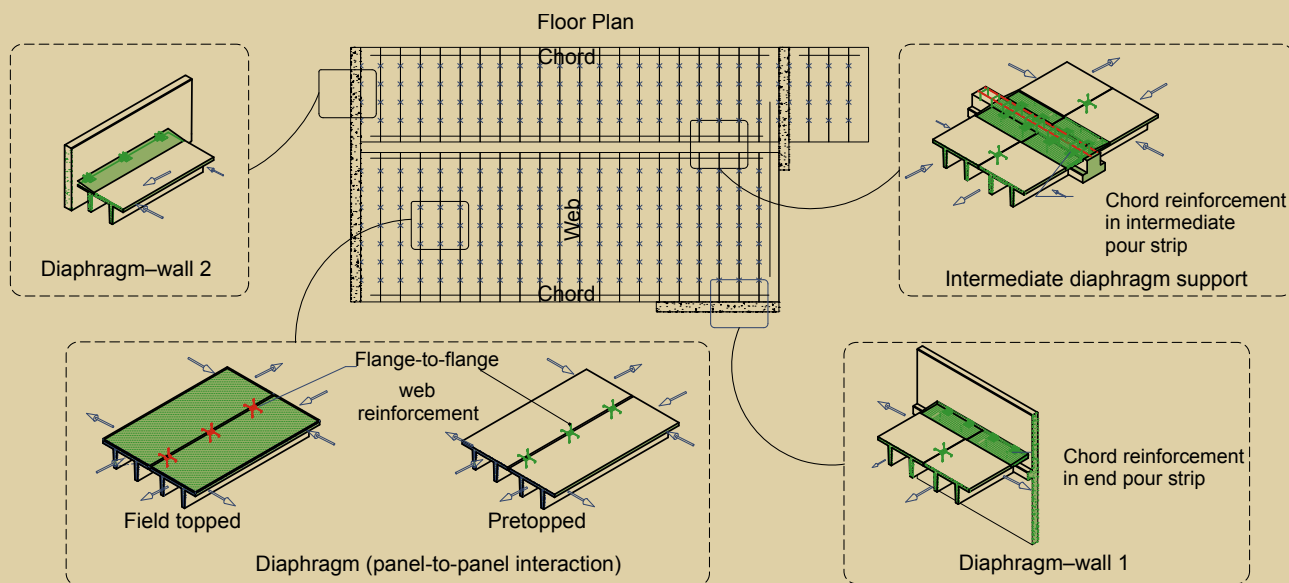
Precast concrete double-tees are typically fabricated with a 2-in.-thick (50 mm) flange and topped in the field with cast-in-place concrete or fabricated with a 4-in.-thick (100 mm) pretopped flange. Also shown are typical precast concrete double-tee diaphragm connections.
